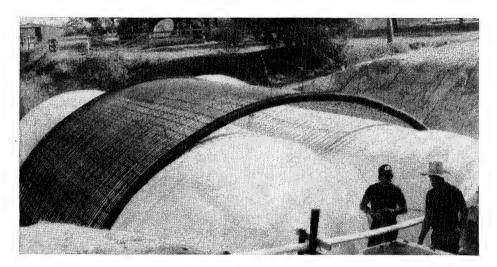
Steel reinforcing forms an arch over inflatable forms used for jobsite precasting arch sections for bridges (from Hurd 1990)
